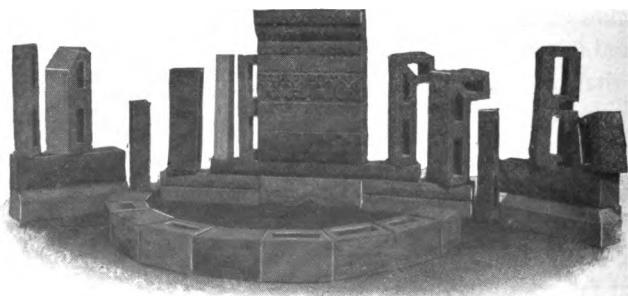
Collection of Concrete Blocks, Made on the Winget Machine.
